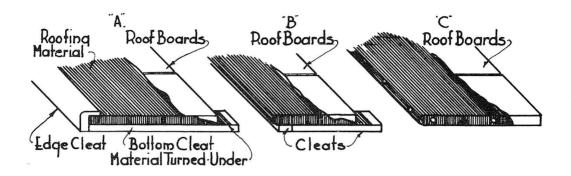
METHODS OF FASTENING ROOF MATERIAL
